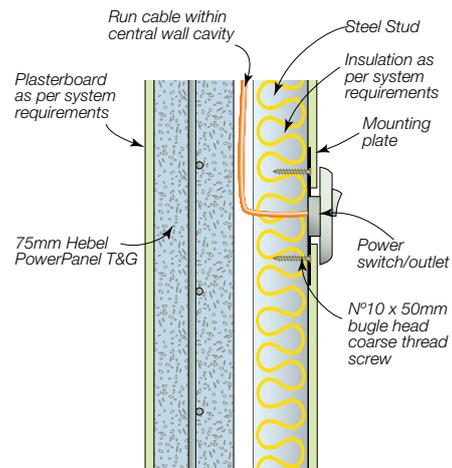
Cable installation within the cavity for switch / outlets located on both sides of wall
